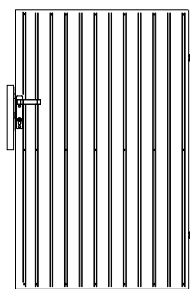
Wicket with AW.10.TT infill - view from the street side.
